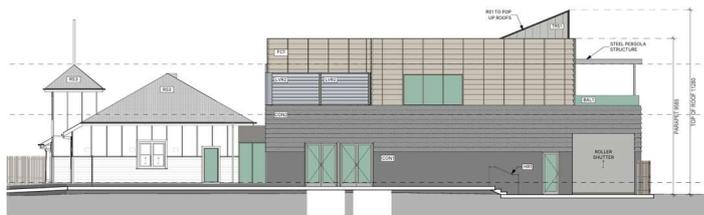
North elevation showing the proximity and scale of the addition to the retained heritage fabric.
